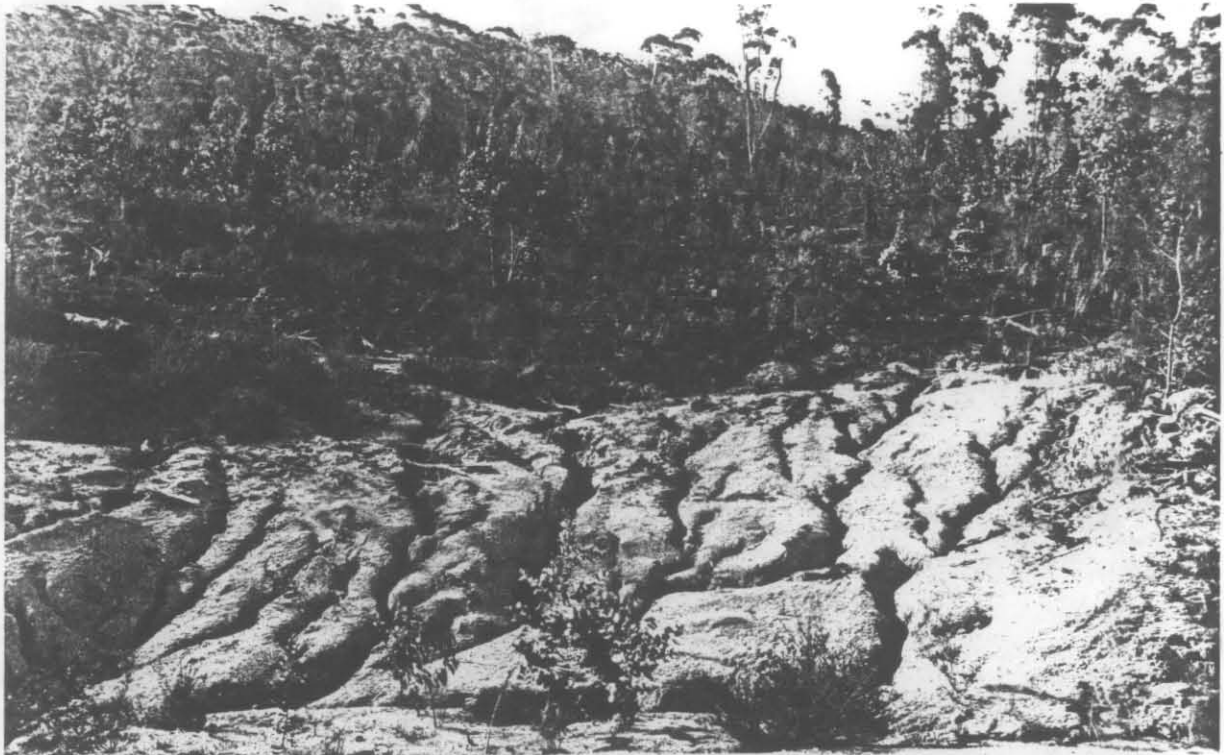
Gullying on embankment excavated for road fill and surfacing.
